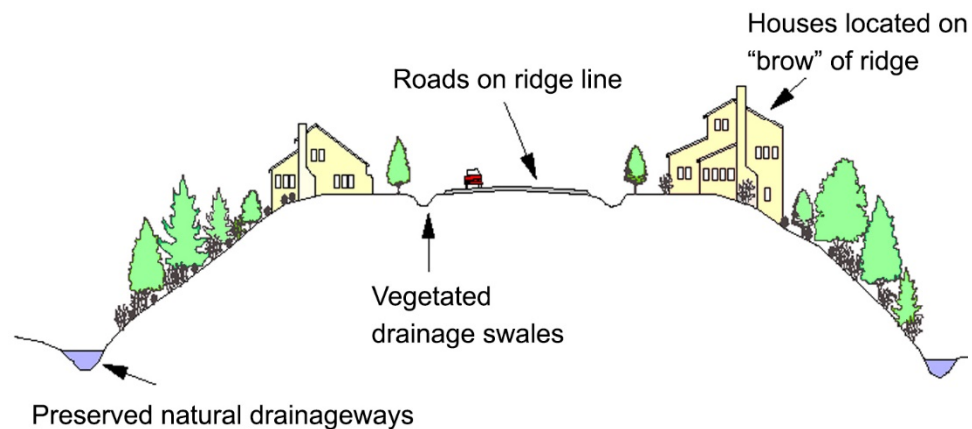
Streets and roadside swales placed along ridge line to preserve natural drainage ways
